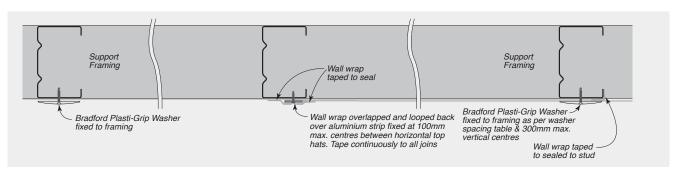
Vertical Wall Wrap Junction - At Control Joint
